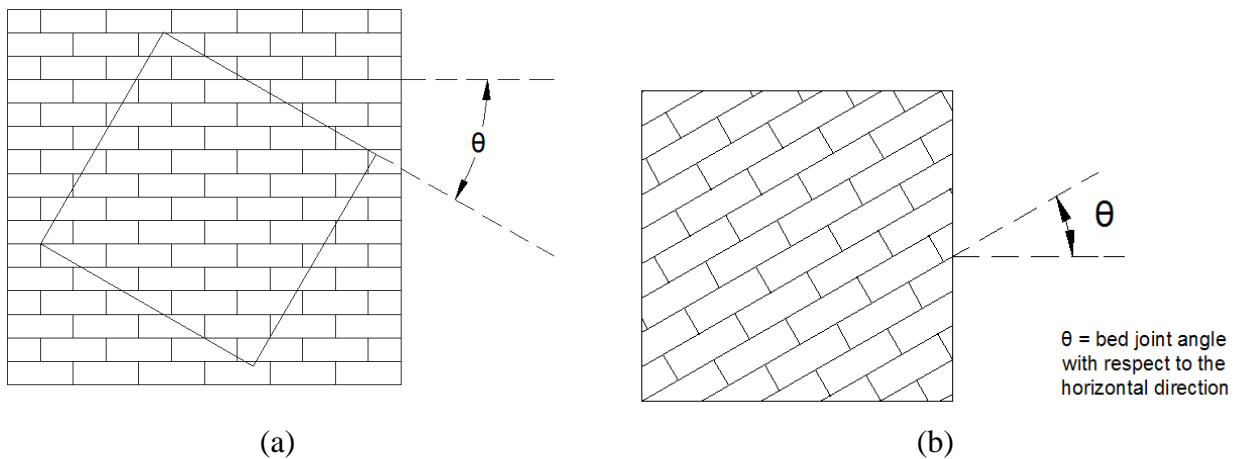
Preparation of specimens. (a) Wall panel before saw cut, (b) Saw cut specimen.
